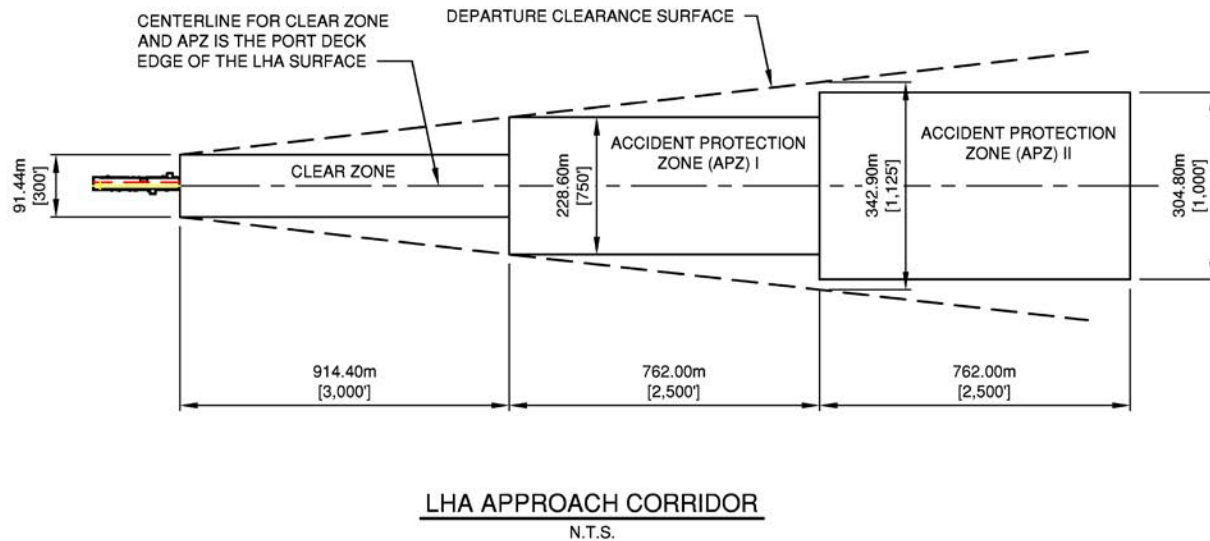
LHD STOVL Facility Approach Path Clear Zones
